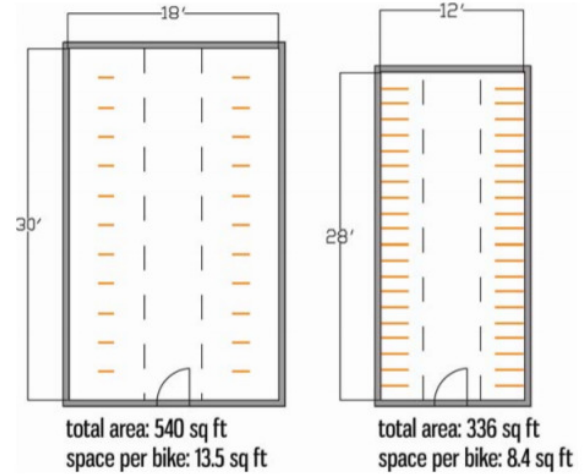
Sample layouts of bicycle parking rooms^{viii}
